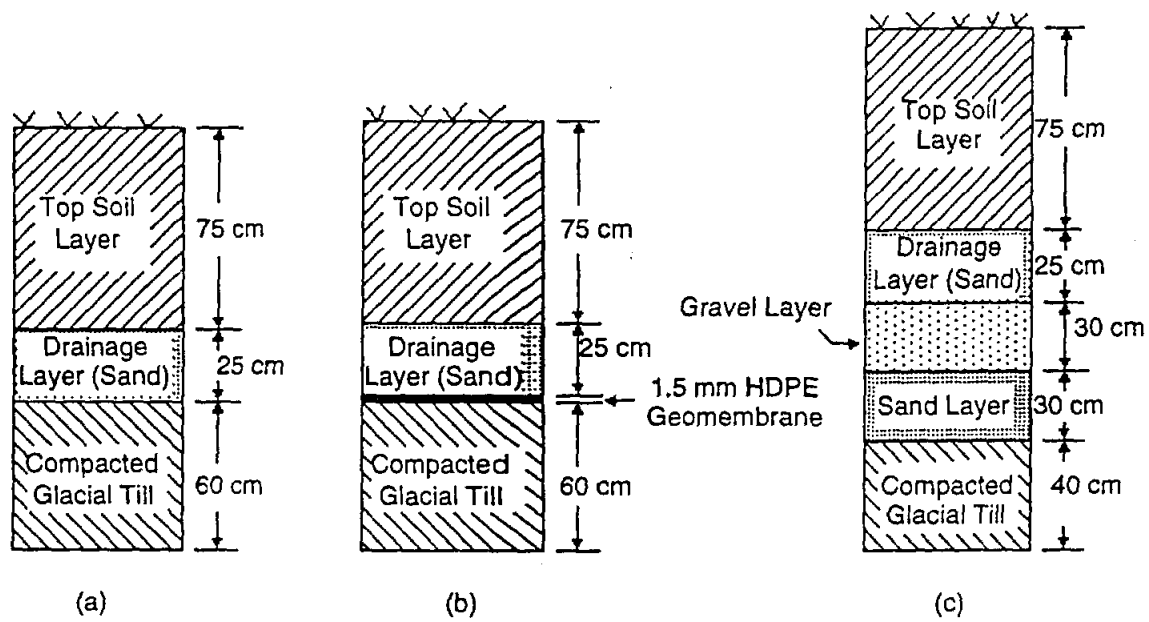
Cross-Section of Test Sections at Georgswerder Landfill Cover Study:
